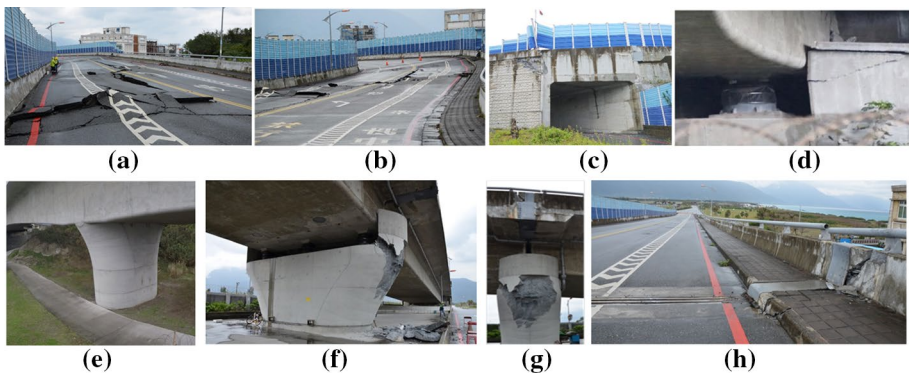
a and b Upheavals of the road embankment approaching abutment A2. c The damaged noise barriers above the culvert. d The cracked seismic stopper at abutment A2. e The intact pier P2. f and g The damaged pier P1. h The expansion joint of abutment A1
